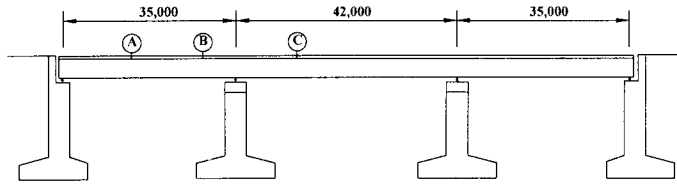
Sketch of a continuous 3-span bridge model (in mm)
